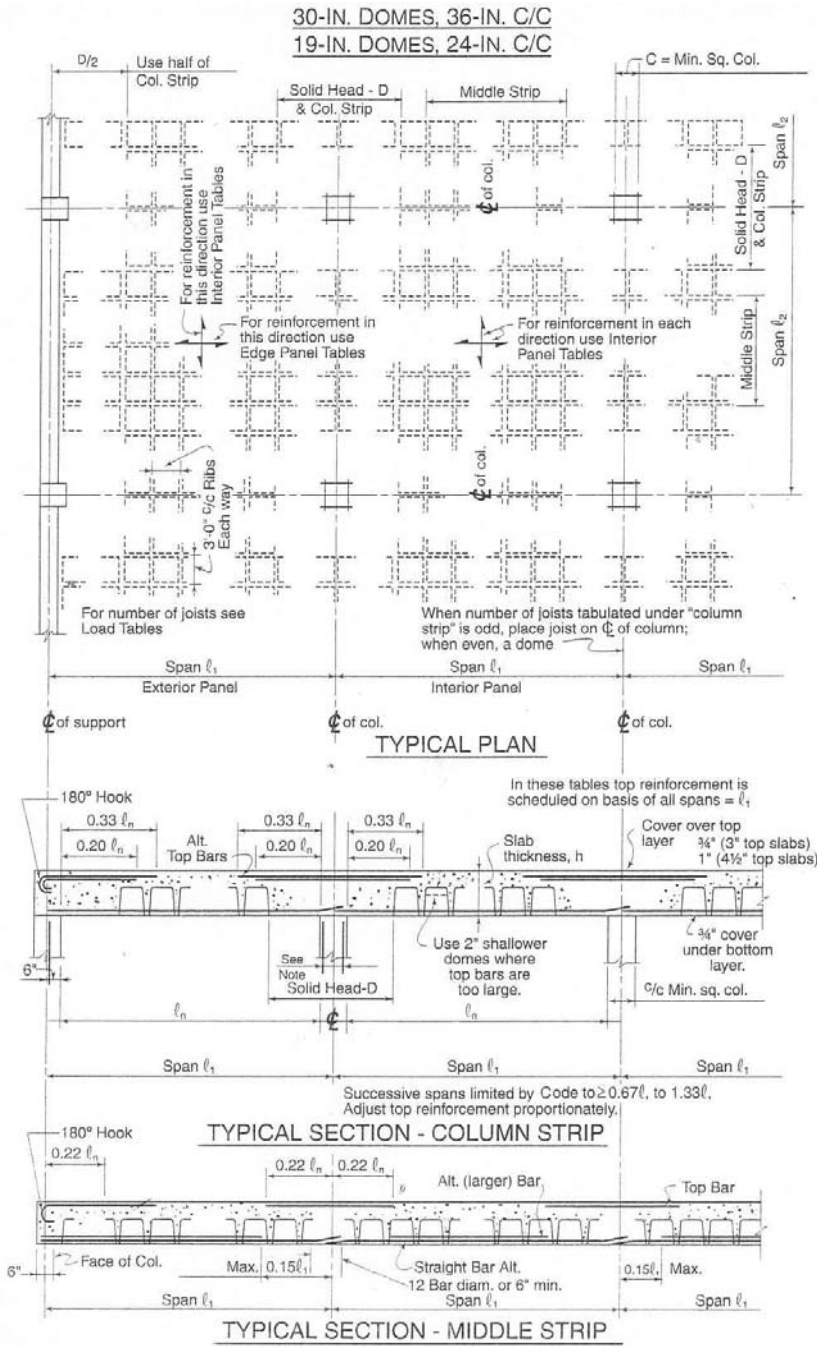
Typical Plan and Sections for Waffle Slab Construction
